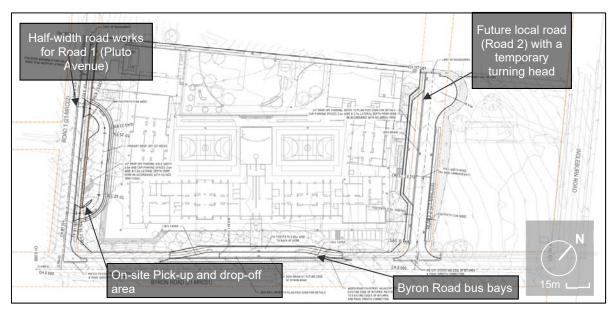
| Siting and road works plan (Source: Applicant's EIS 2019)
